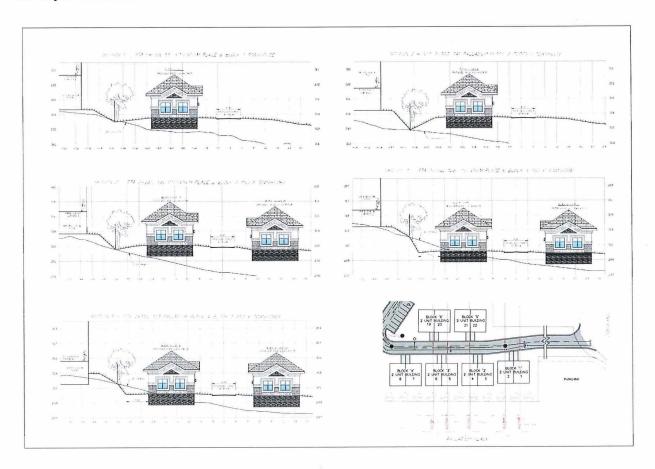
Proposed Elevation Cross Section of Condo Development and rear yards from Palladium Place
